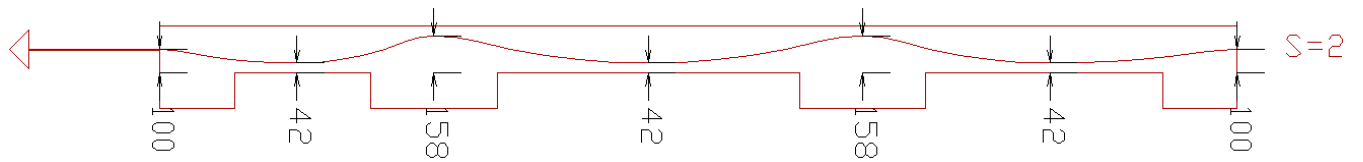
ELEVATION OF A TYPICAL BANDED TENDON
